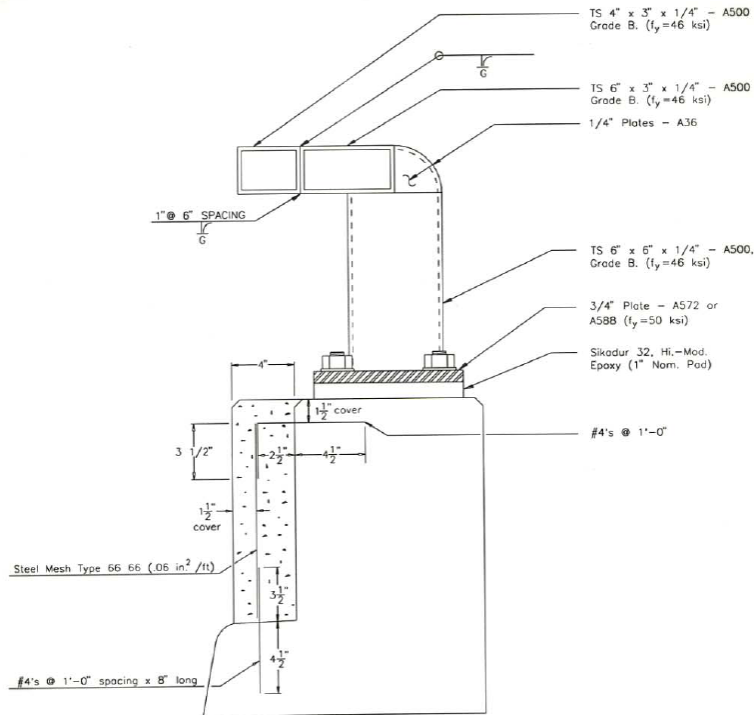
Minnesota Type Three Combination Bridge Railing – modified design.²
